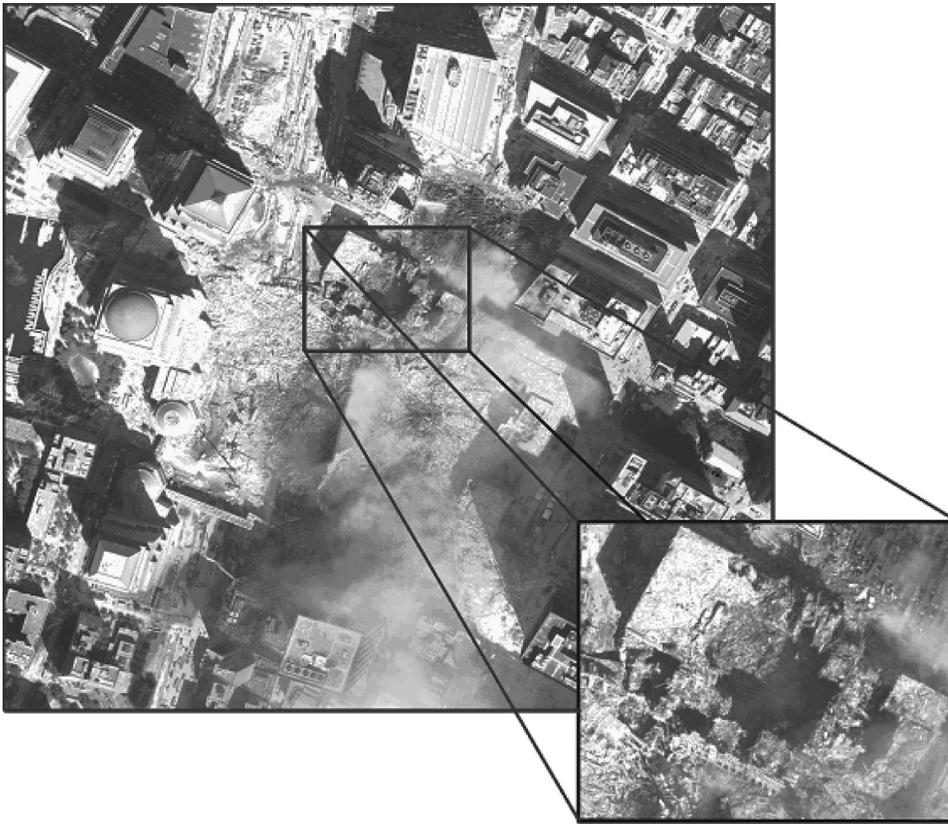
Digital orthophoto over World Trade Center site taken September 15, 2001, with detail of Building 6.
